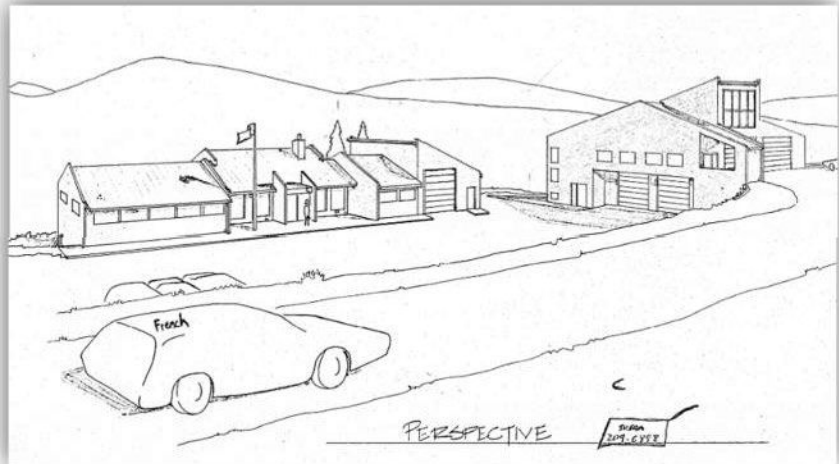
Perspective sketch of Town Hall Building (left) and Town Maintenance Facility (right) from 1982 drawing set.
